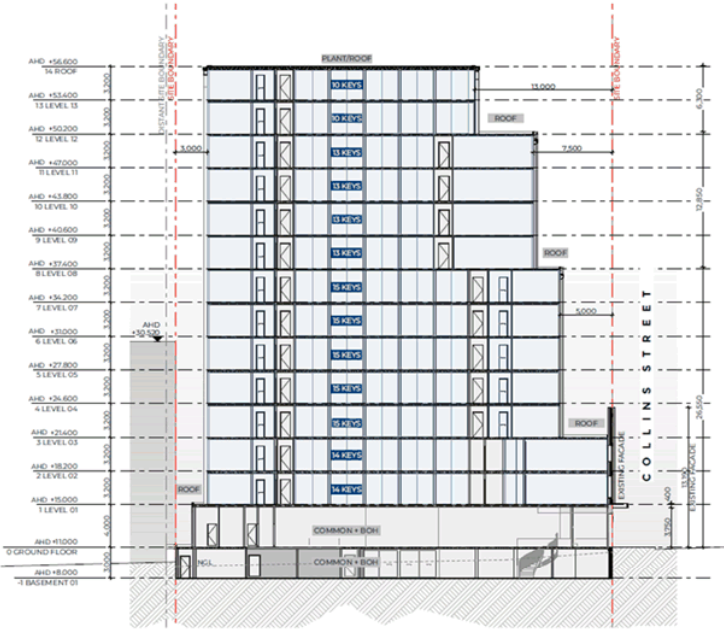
Section of proposed built form (Source: Telha Clarke Architects)
